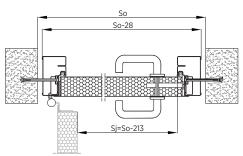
Installation of a single-leaf door to a masonry wall – internal frame with a thermal break – horizontal cross-section
